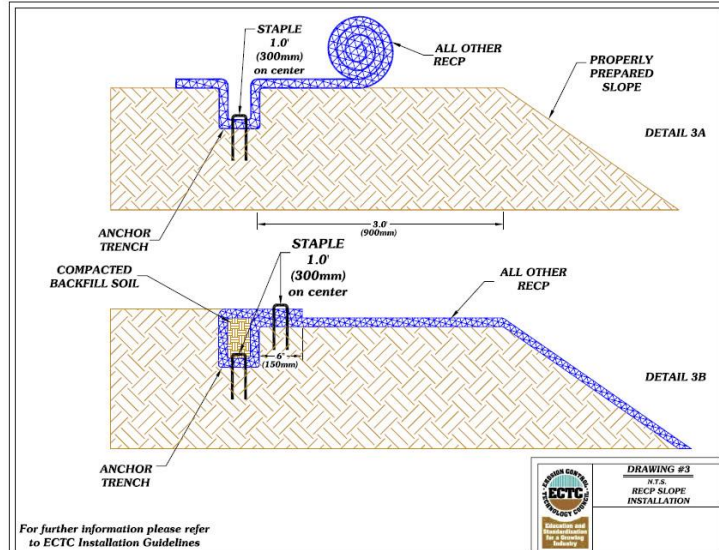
Detail for Anchor Trench Preparation (ECTC 2014).
